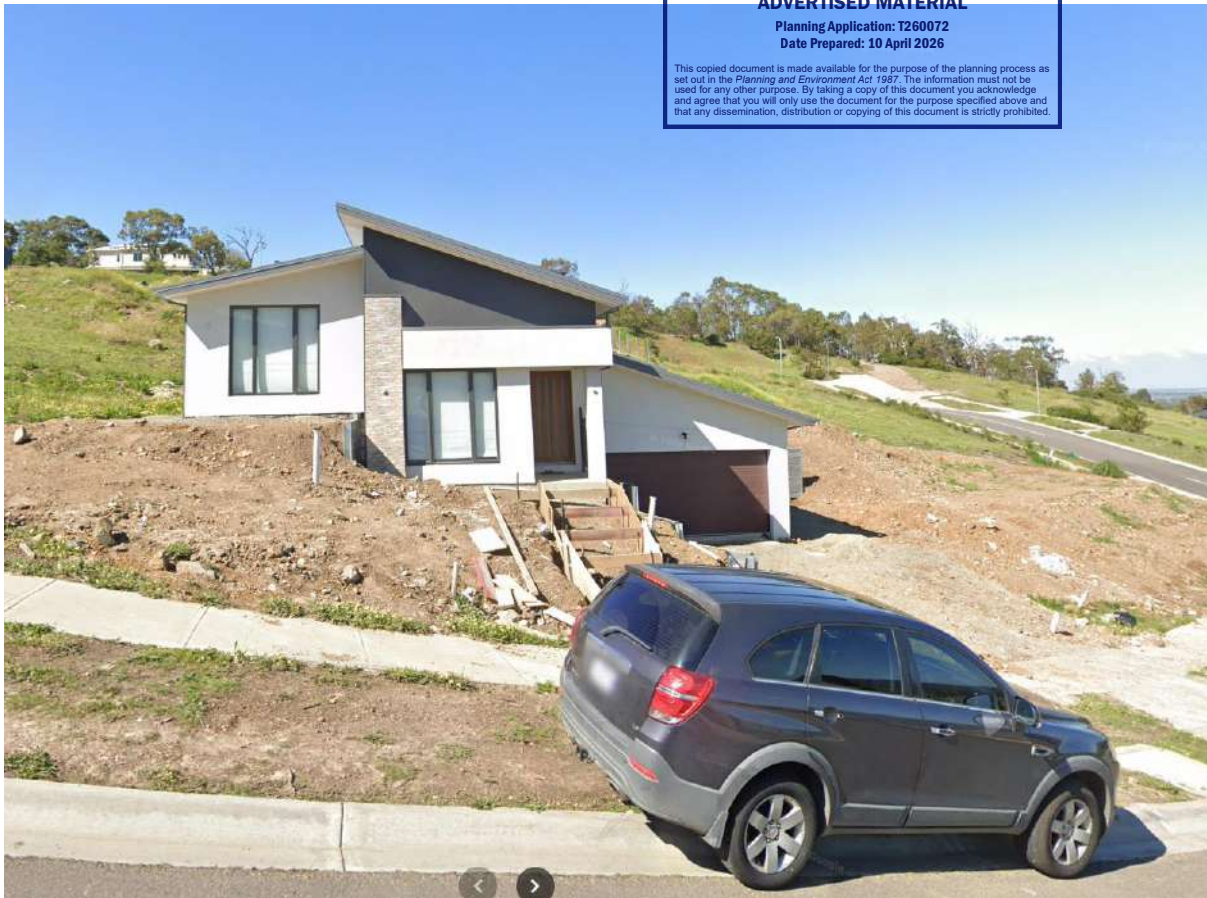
Further adjacent of subject site. Properties No. 18-20 Blessing Rise remain vacant. However, property No. 16 Blessing Rise has been occupied. Presents modern construction, single storey dwelling with a prominent flat roof. It also features a stone cladded front column, clean lines and timbered garage door.
